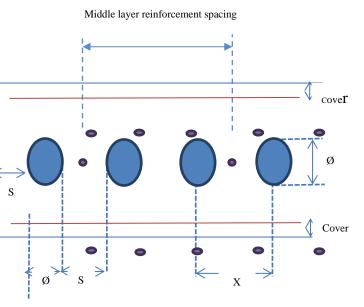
Typical cross section of slab with top, bottom and middle layer reinforcement placed in between balls for all bubble deck slabs
